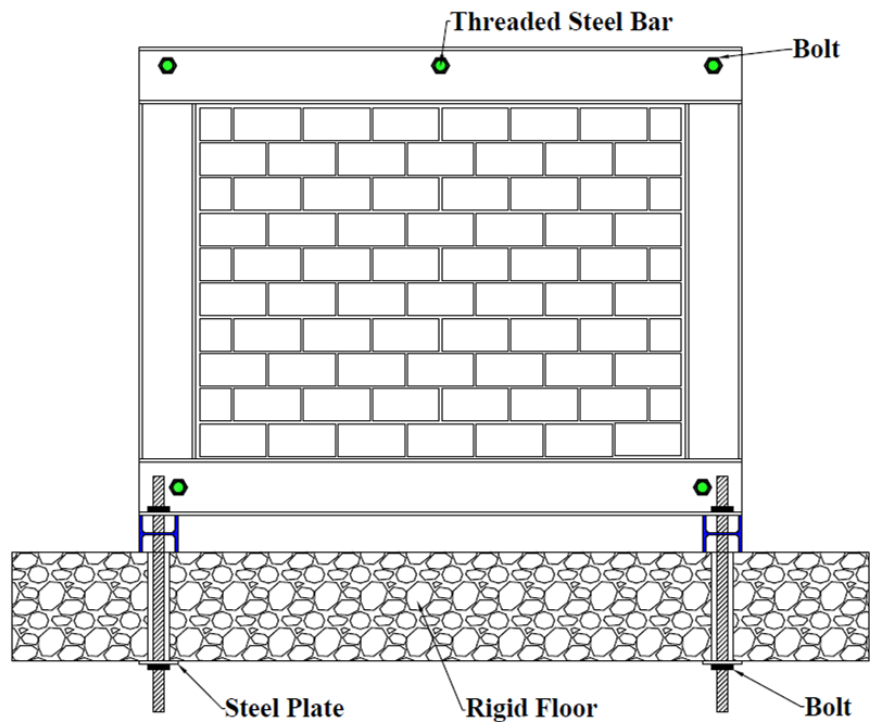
Schematic Front View of Test Set-up for Steel Infilled Frame Specimen
